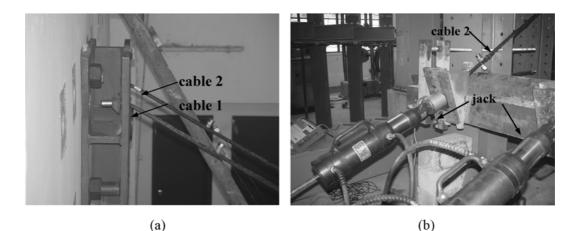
Stay cables tested in the Lab. (a) Cable ends fixed to the wall, (b) Cable ends tensioned by jack
